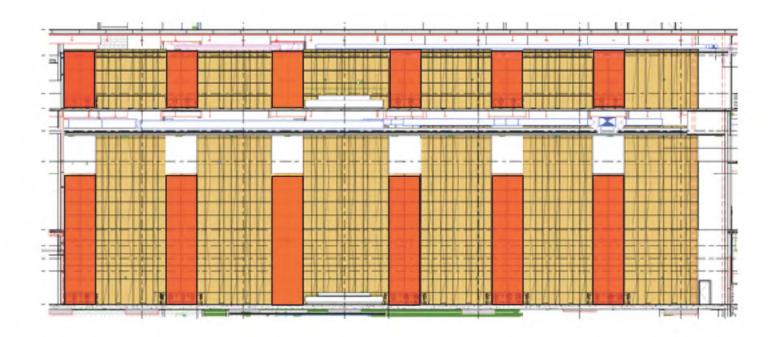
ELEVATION SHOWING ELEVATOR NICHES ART SITES
